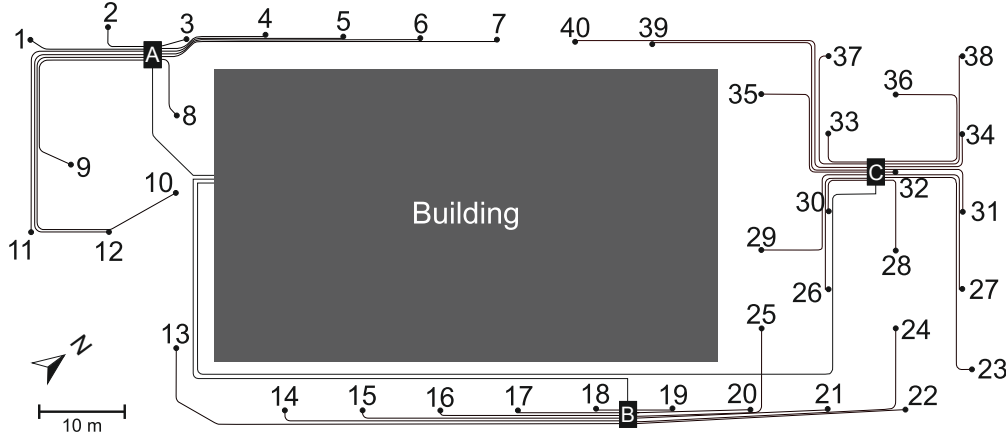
Plan view of the connection pipe network of the 40 BHEs arranged in the three manifolds A, B and C.
